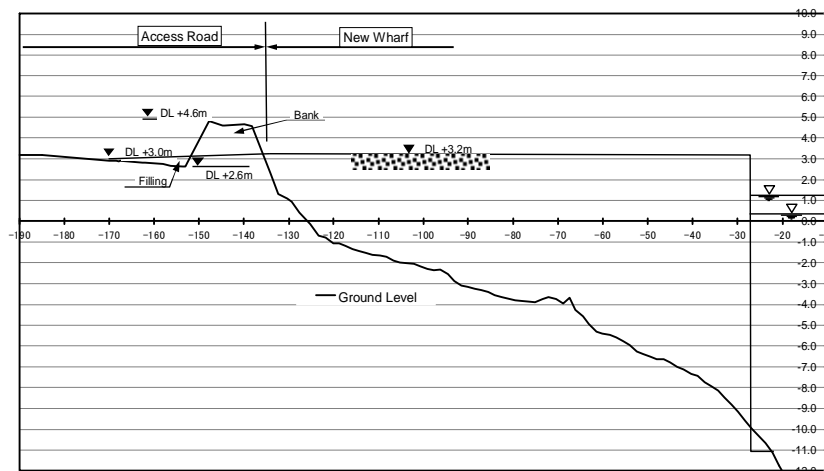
Longitudinal Section of North Access Road
